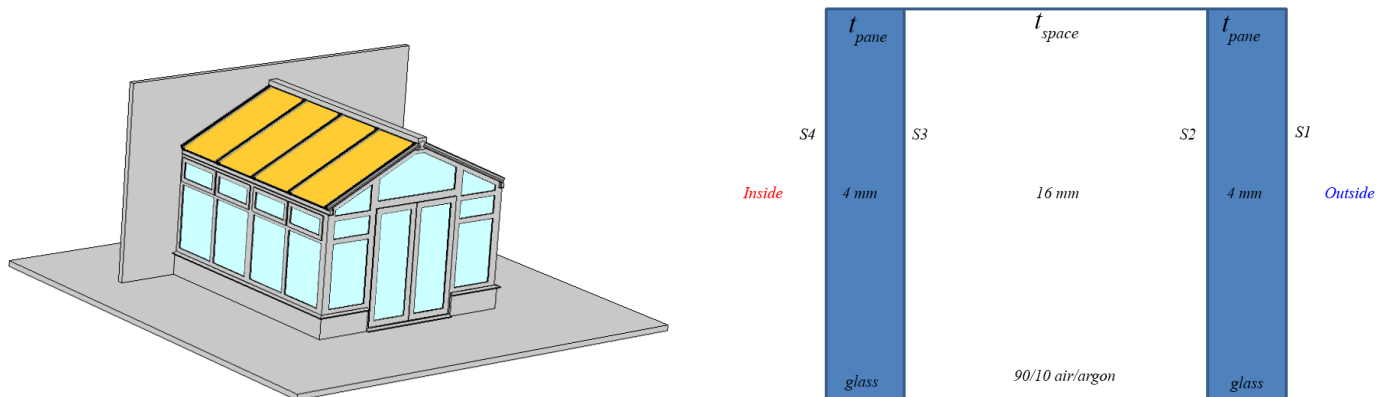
Case 1 conservatory installation with clear glazing to walls and bronze-tinted, anti-sun glazing to roof.
